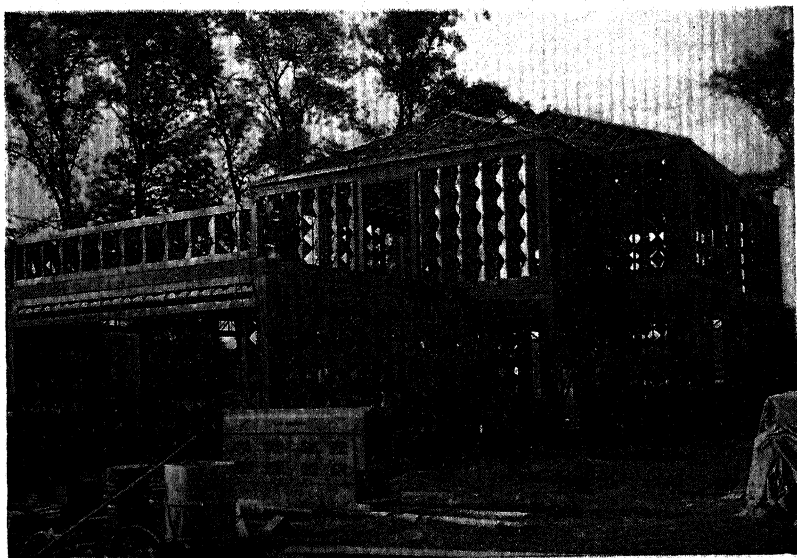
This all-steel arc welded home features a cellular construction. Panels for floor, walls and roof came to the job in sections completely fabricated and ready for assembly. The exterior of the house can be brick, stucco, wood or other material.
